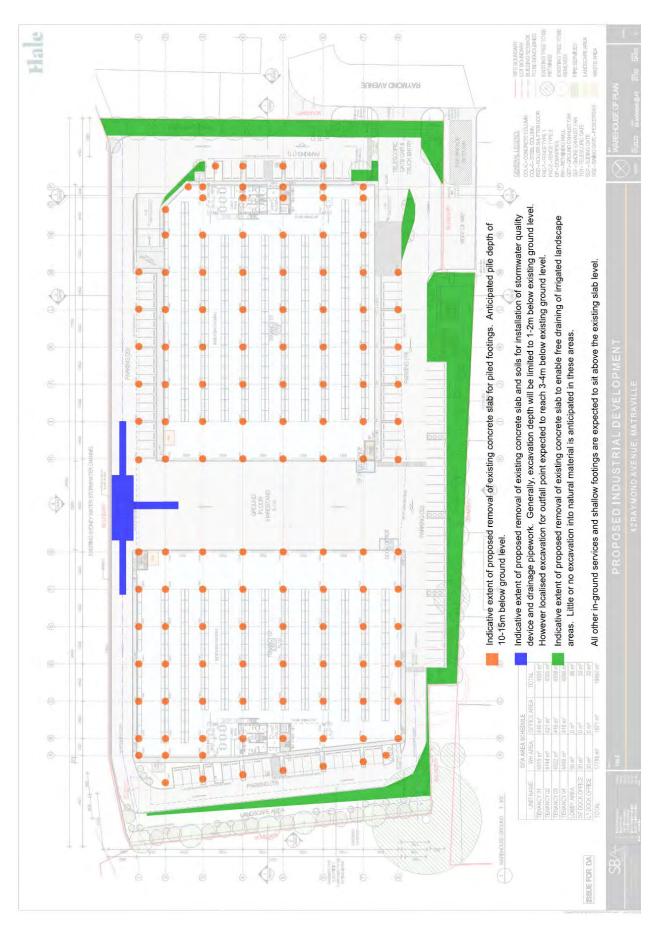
Proposed ground disturbing works Source: SBA Architects
